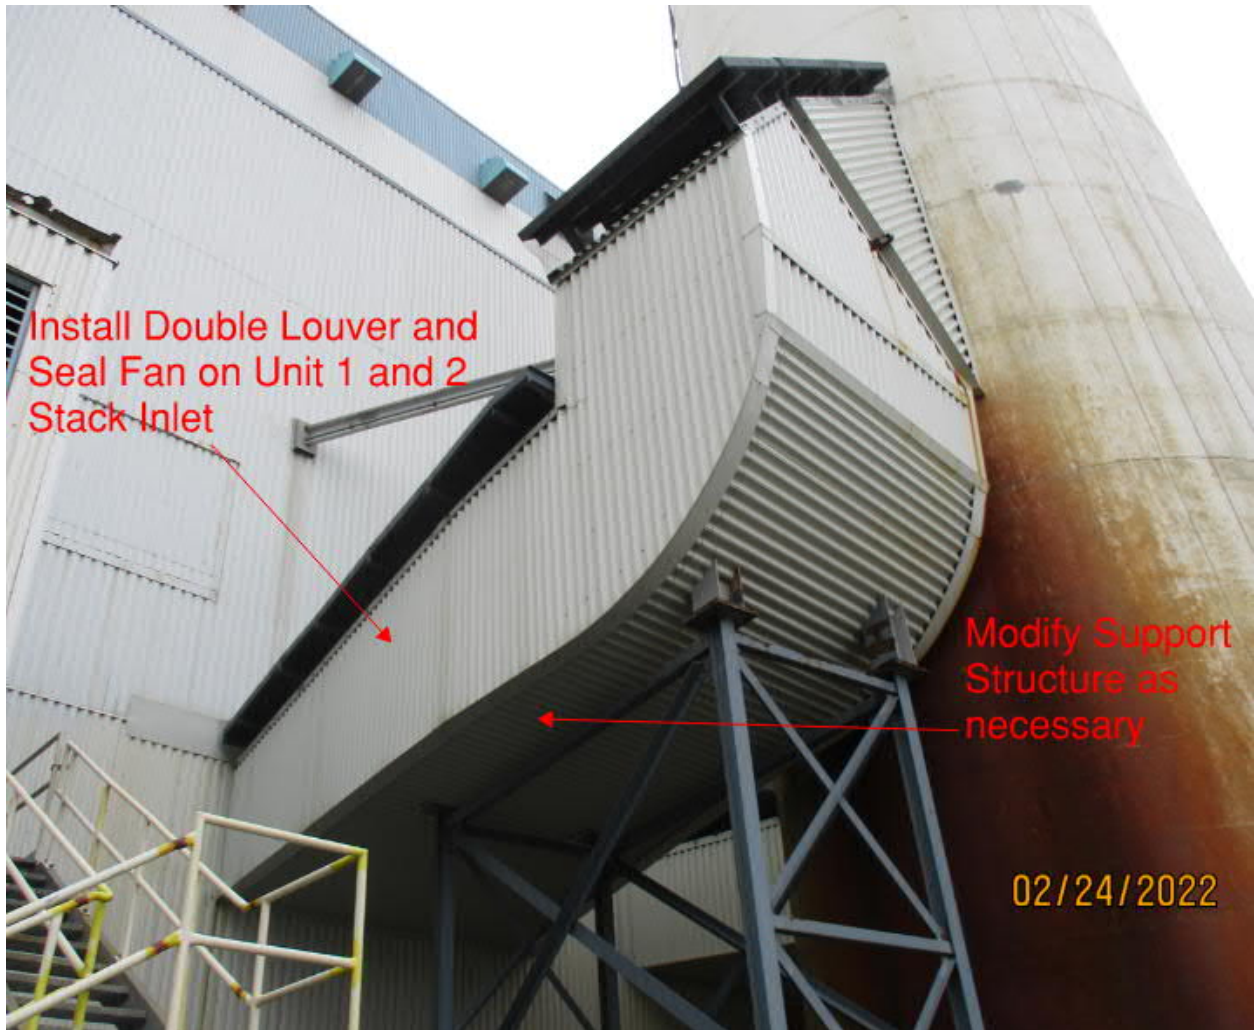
Recommended Damper Unit 1 and 2 Install Location
